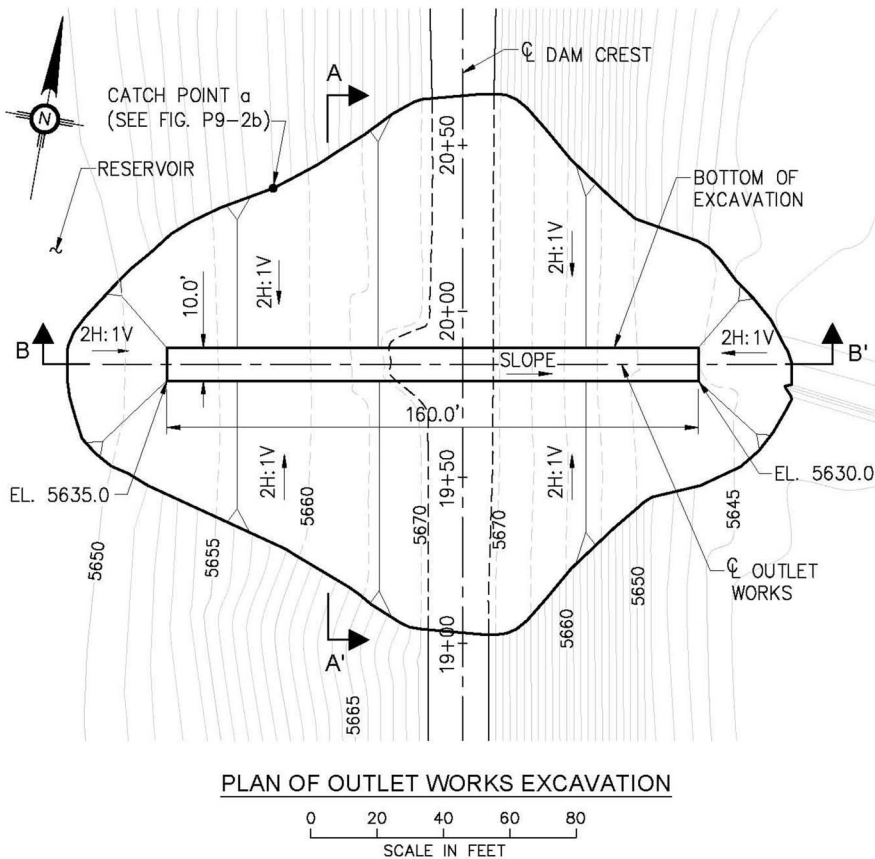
S-4. Excavation Catch Lines of Outlet Works
